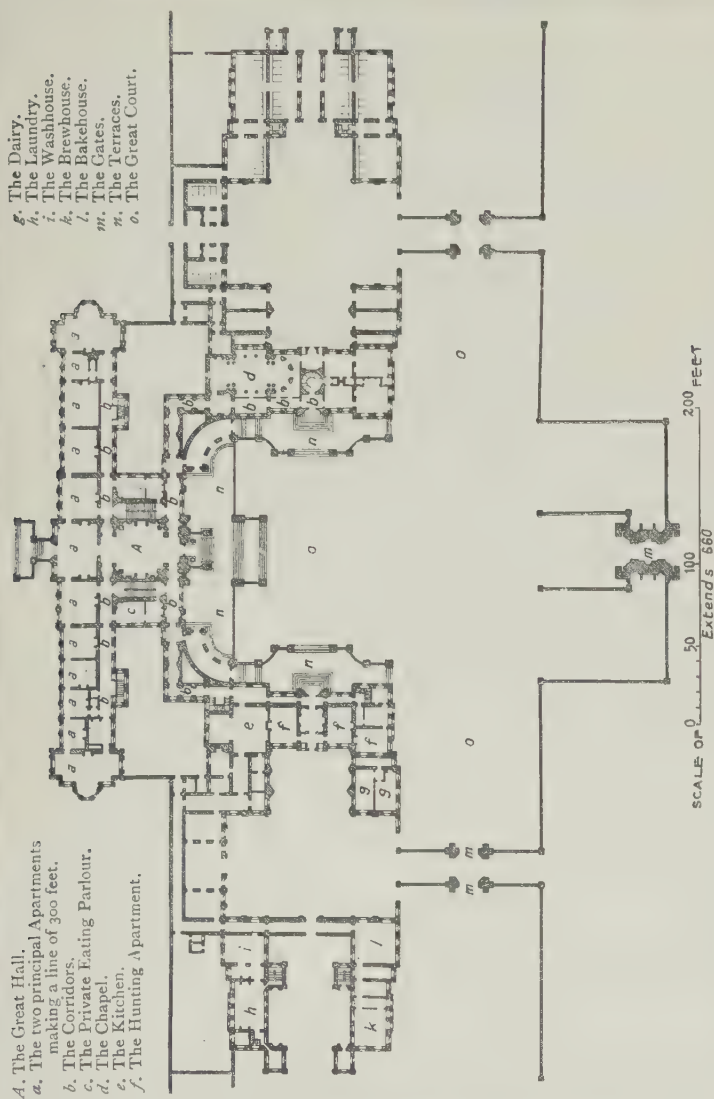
Castle Howard, Yorkshire. Plan of Principal Floor.
